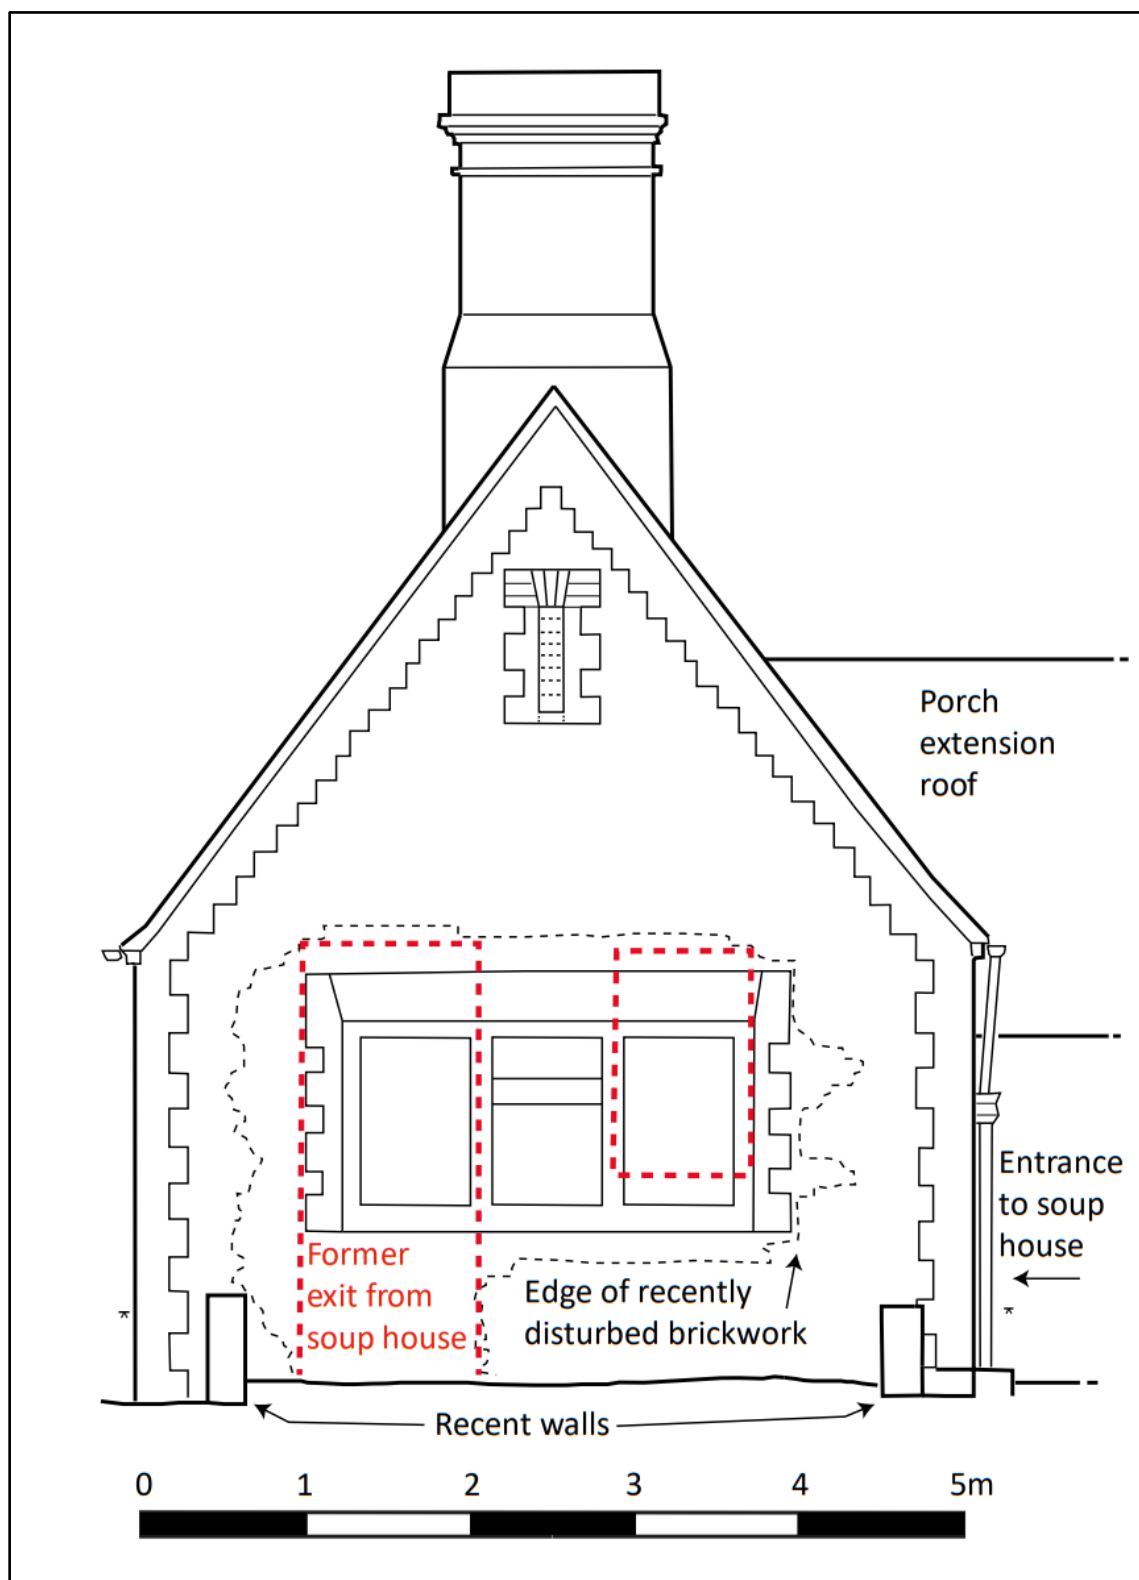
The south wall of the Soup House showing the repaired brickwork and former exit and window.
